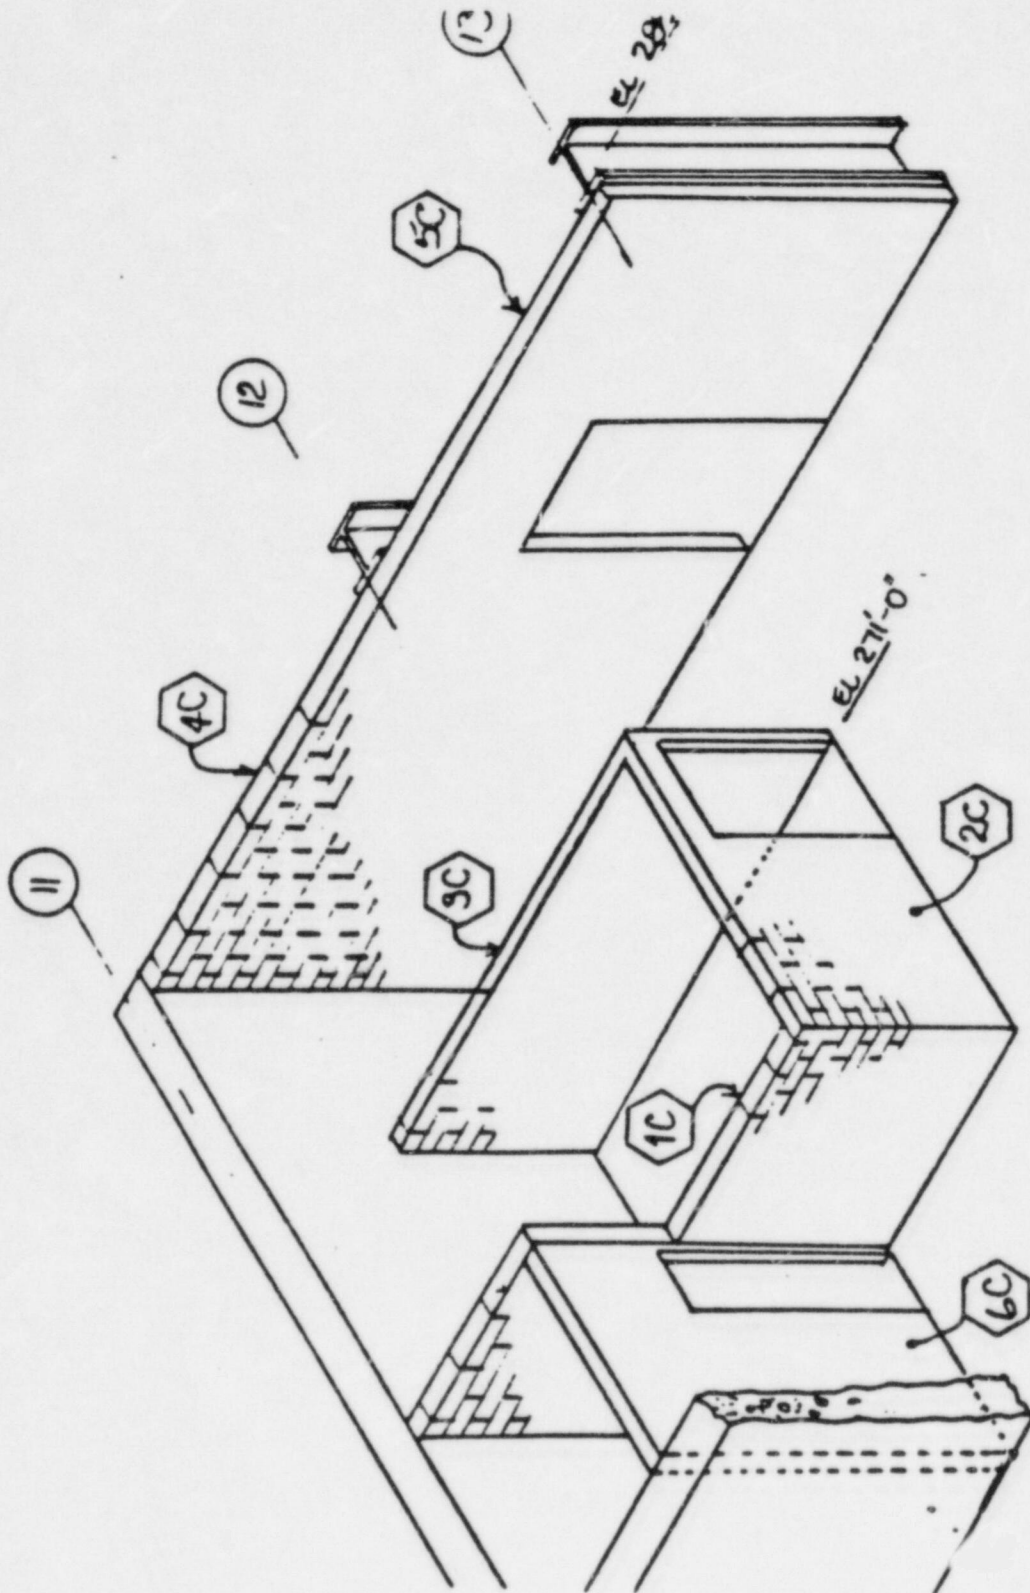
Control Building Walls Elevation 271 feet, 0 inches
